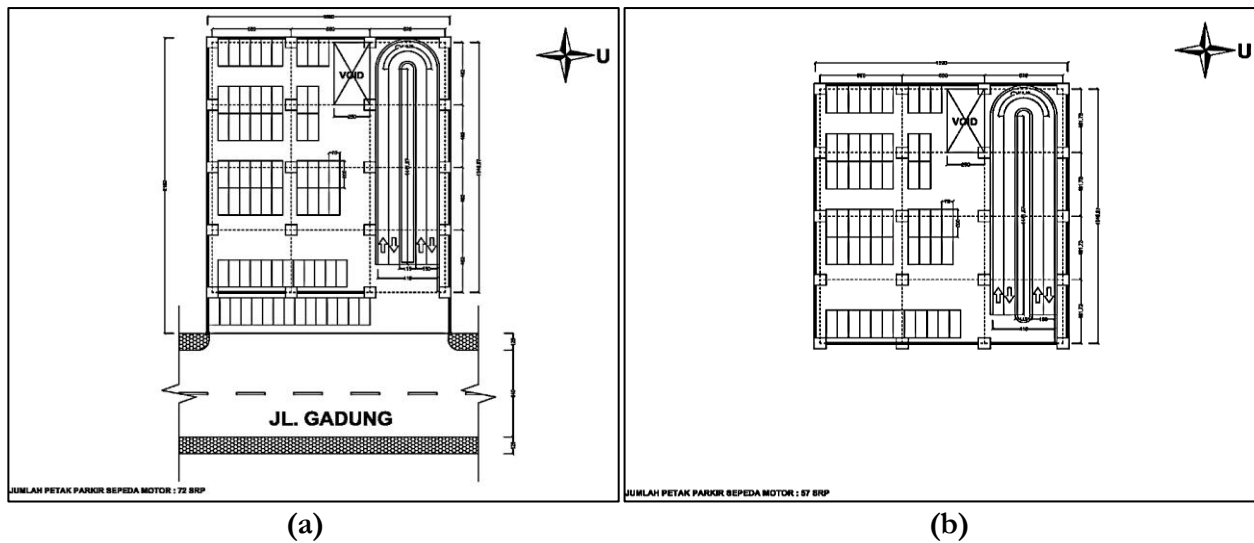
(a) Floor Plan of Parking Building 1st Floor; (b) Planning for Floors 2, 3, and 4 of the Parking Building
